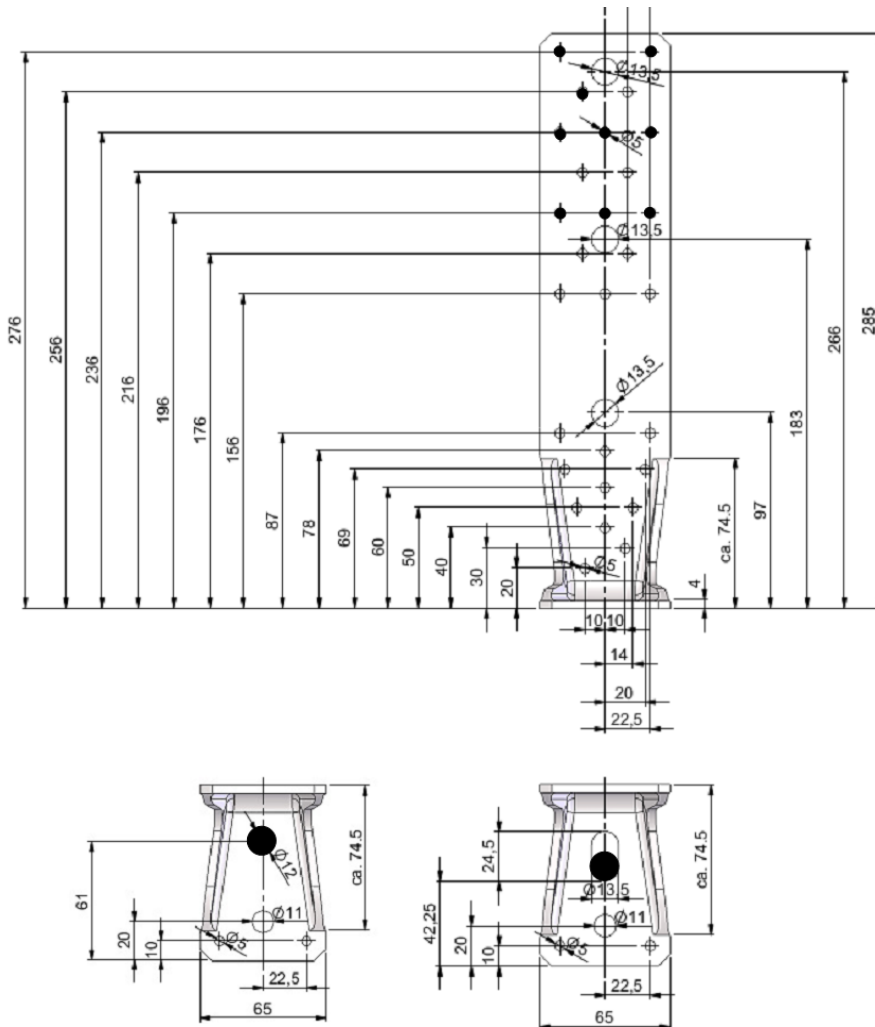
Nail Patterns of Angle Bracket KR 285 - column connection
